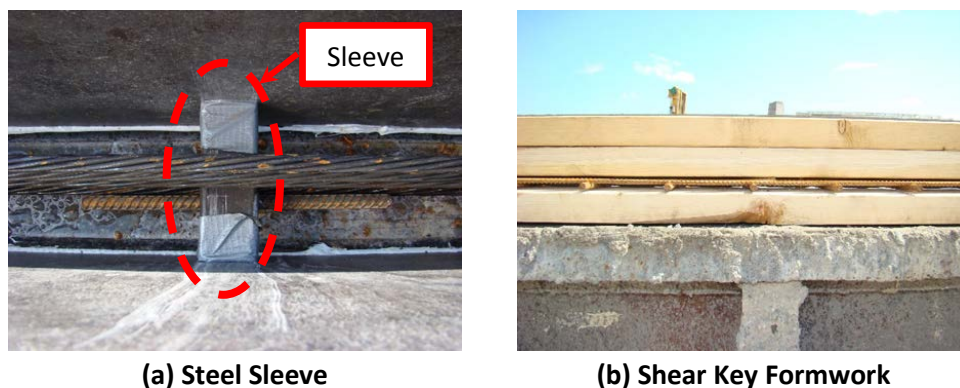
Steel Sleeve and Shear Key Timber Formwork – “Proposed” Specimen
